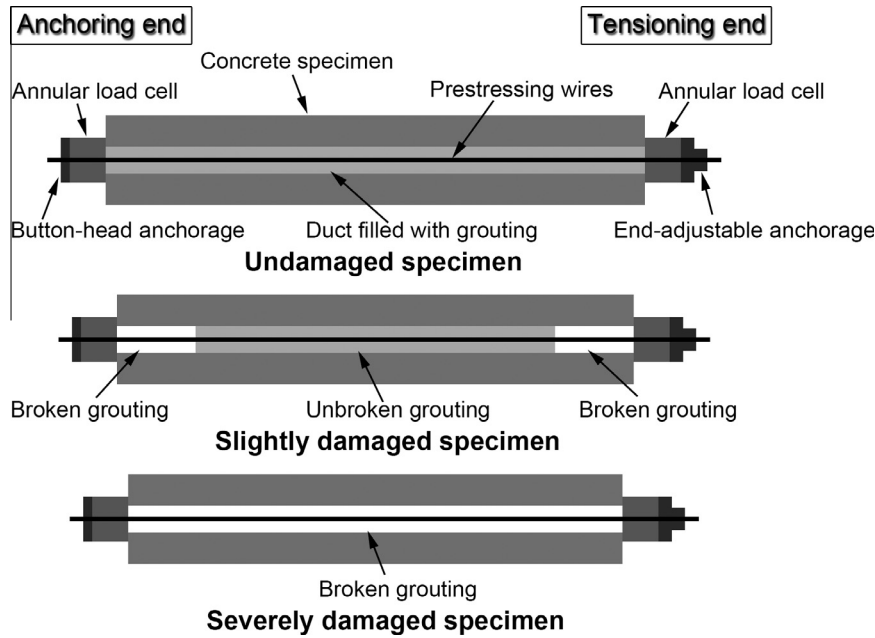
Duct grouting of bonded prestressed specimen under the attack of FTCs.
